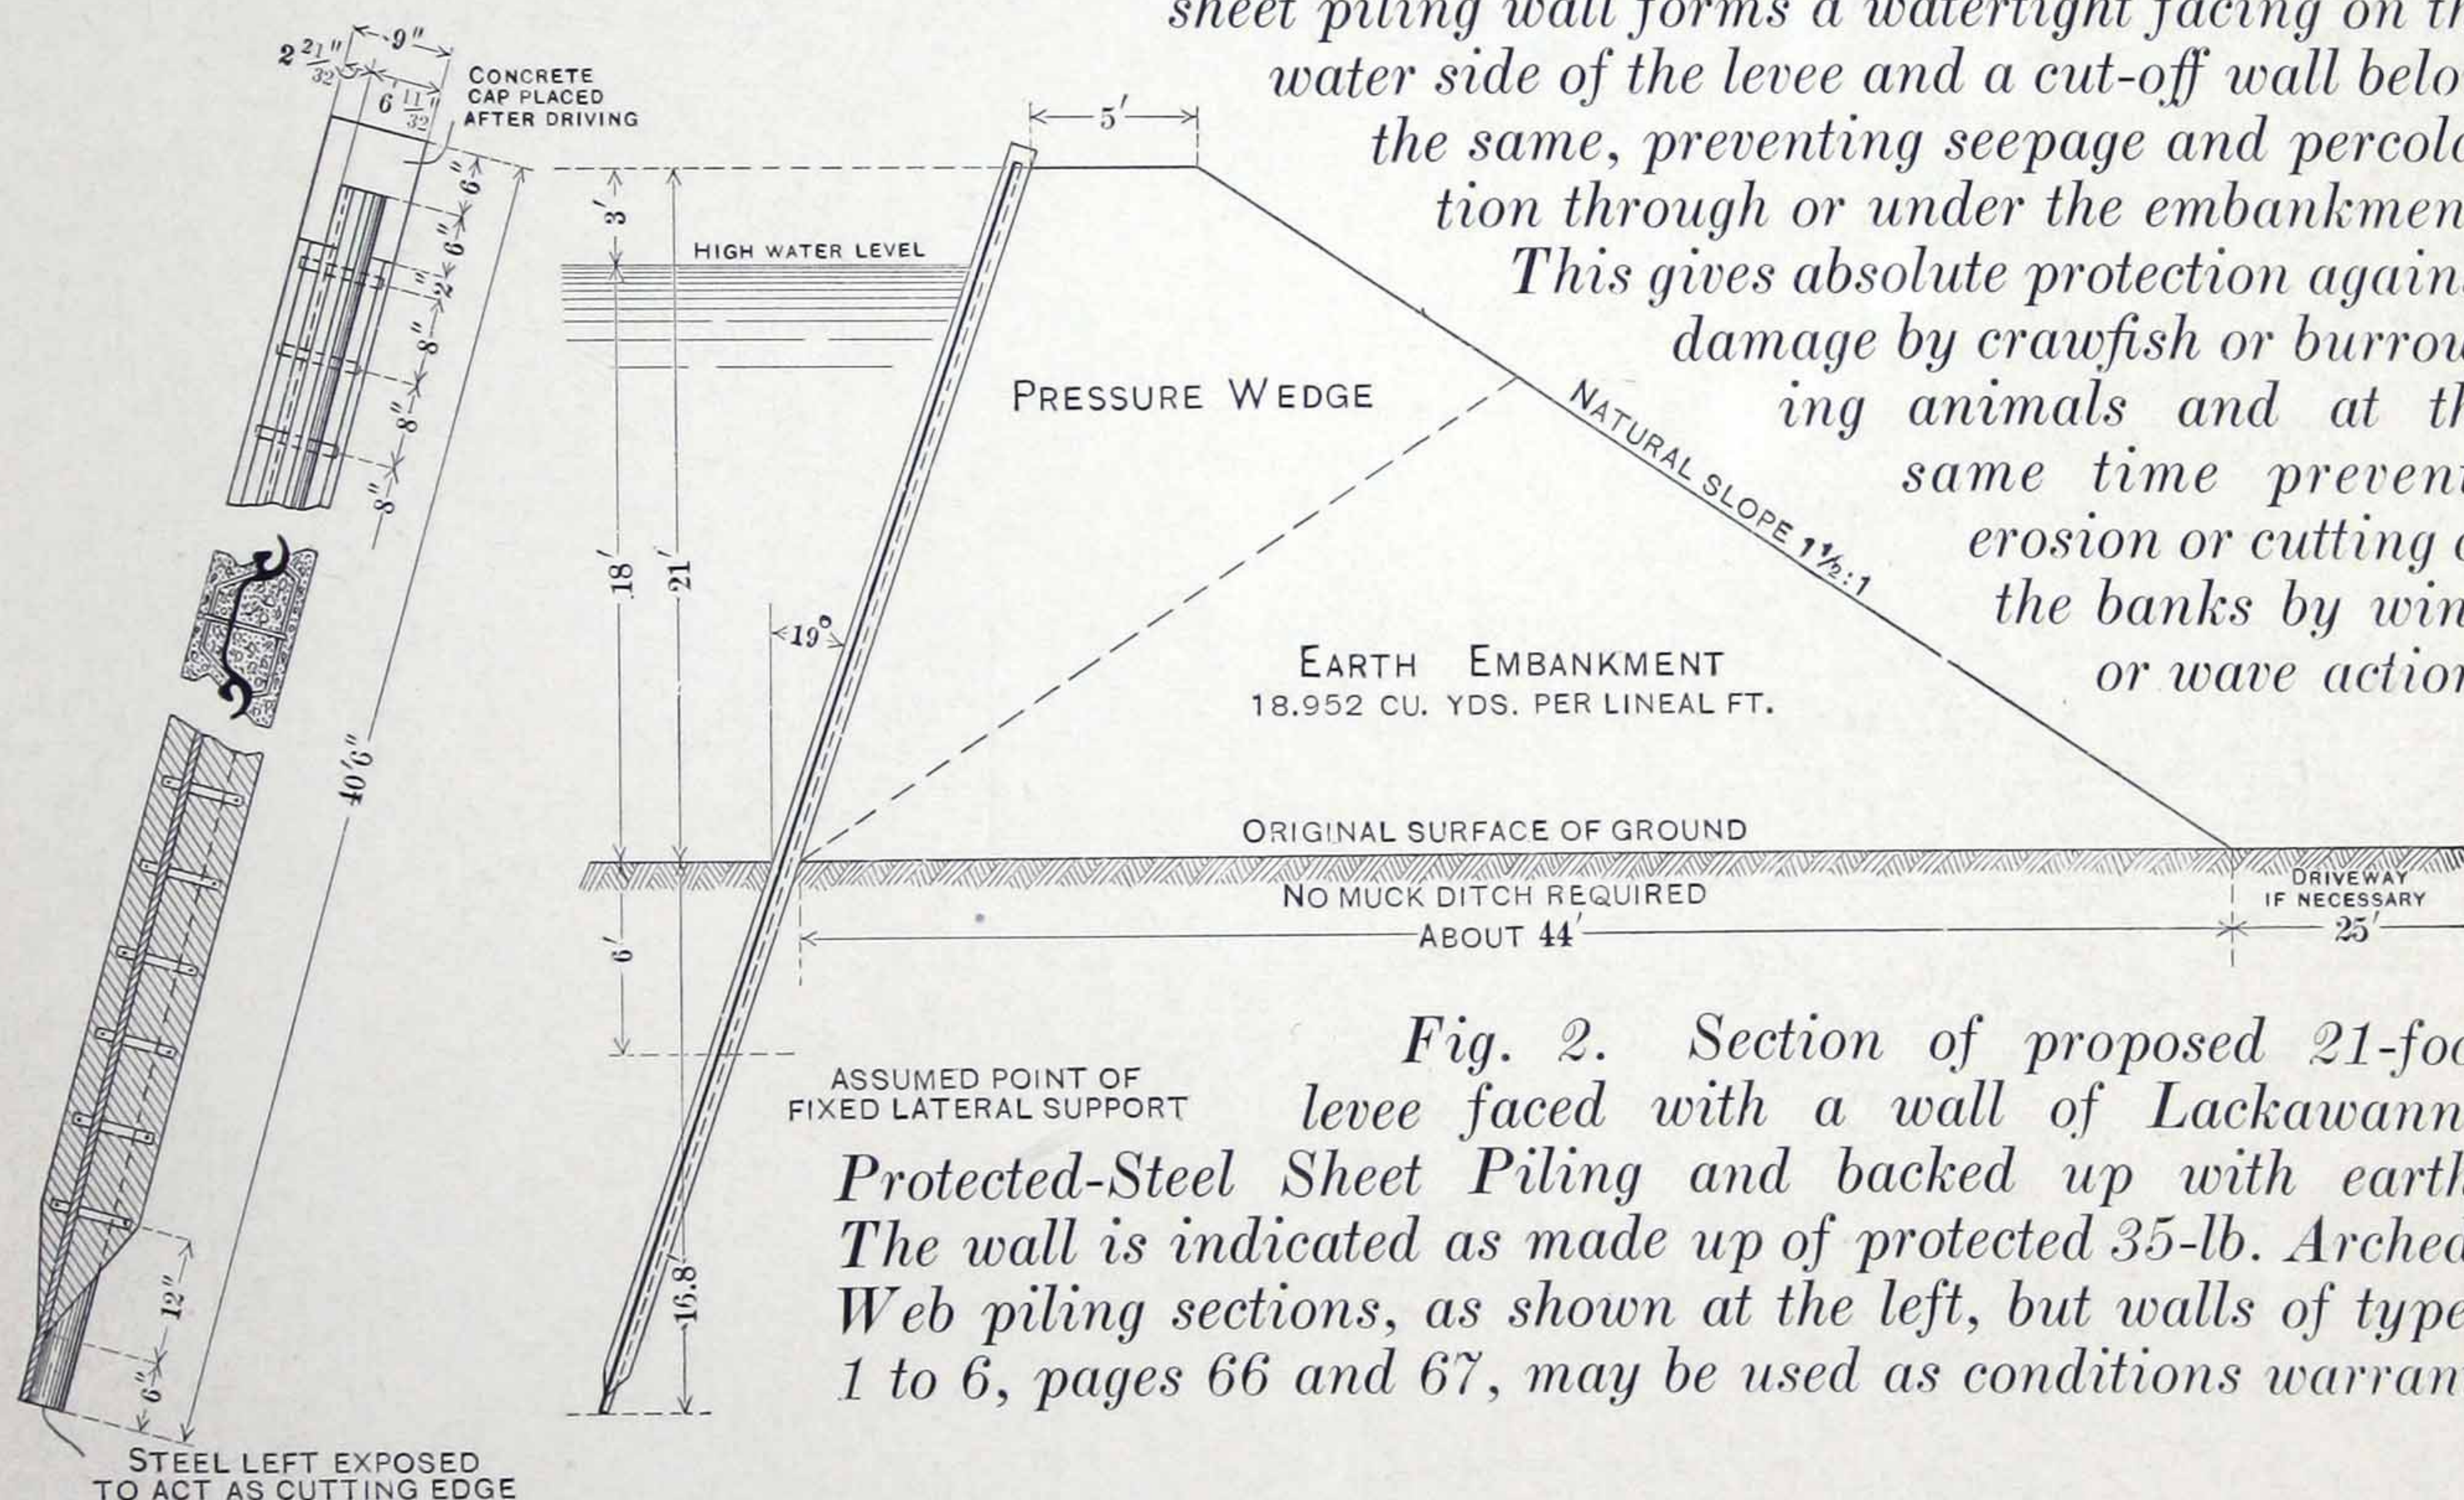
Section of proposed 21-foot levee faced with a wall of Lackawanna Protected-Steel Sheet Piling and backed up with earth. The wall is indicated as made up of protected 35-lb. Arched-Web piling sections, as shown at the left, but walls of types 1 to 6, pages 66 and 67, may be used as conditions warrant.
